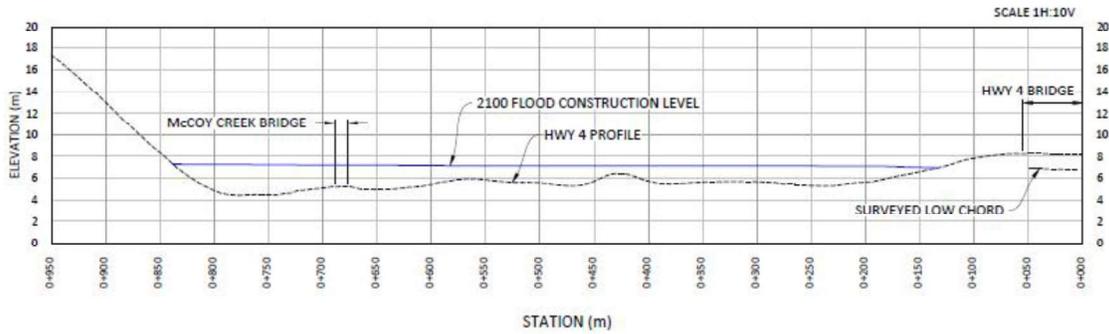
Plan and profile view of Highway 4 and the 2100 FCL.
